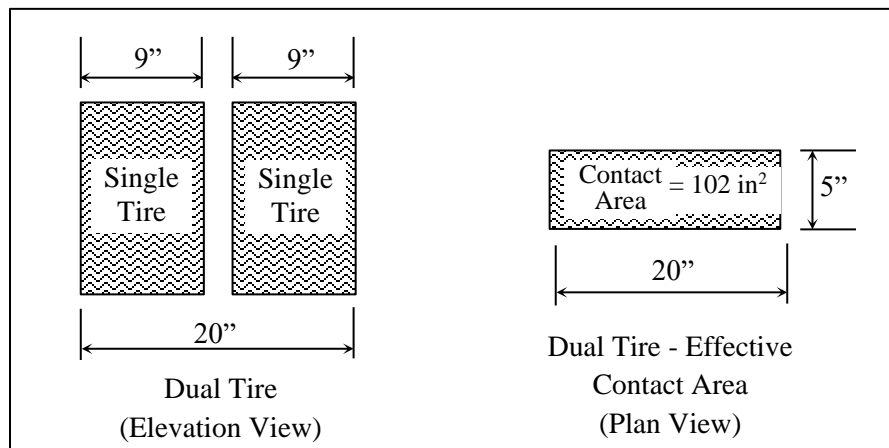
Dual Tire Elevation View and Plan View
